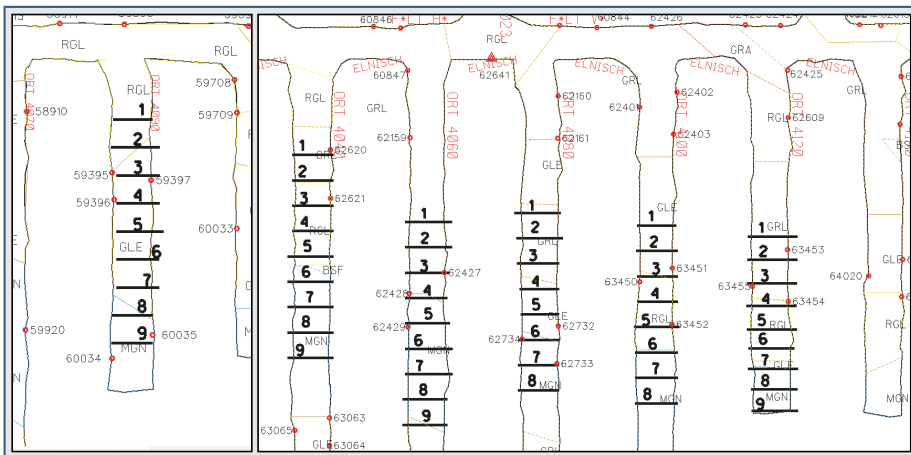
Floor heave measurement sections in PR996 (left) and PR1023 (right).
